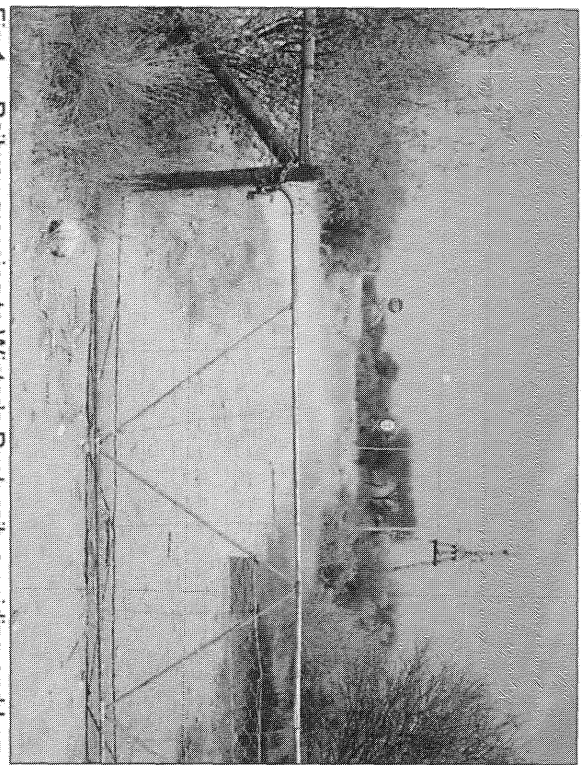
Railway crossing to Winter's Rush railway siding and Longlands 231.
